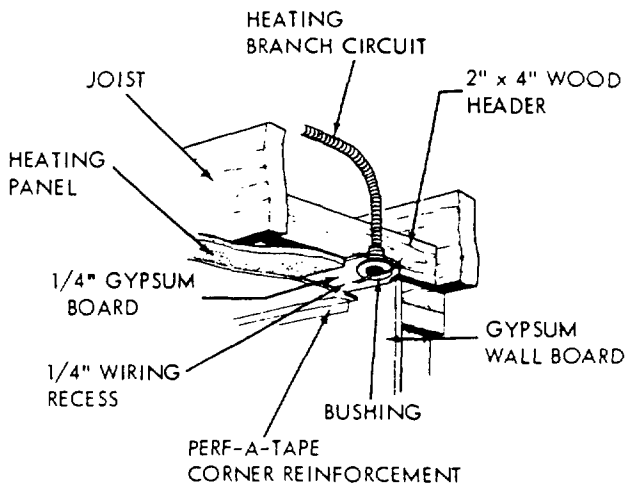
Wiring Recess Construction (1/4" Depth)
